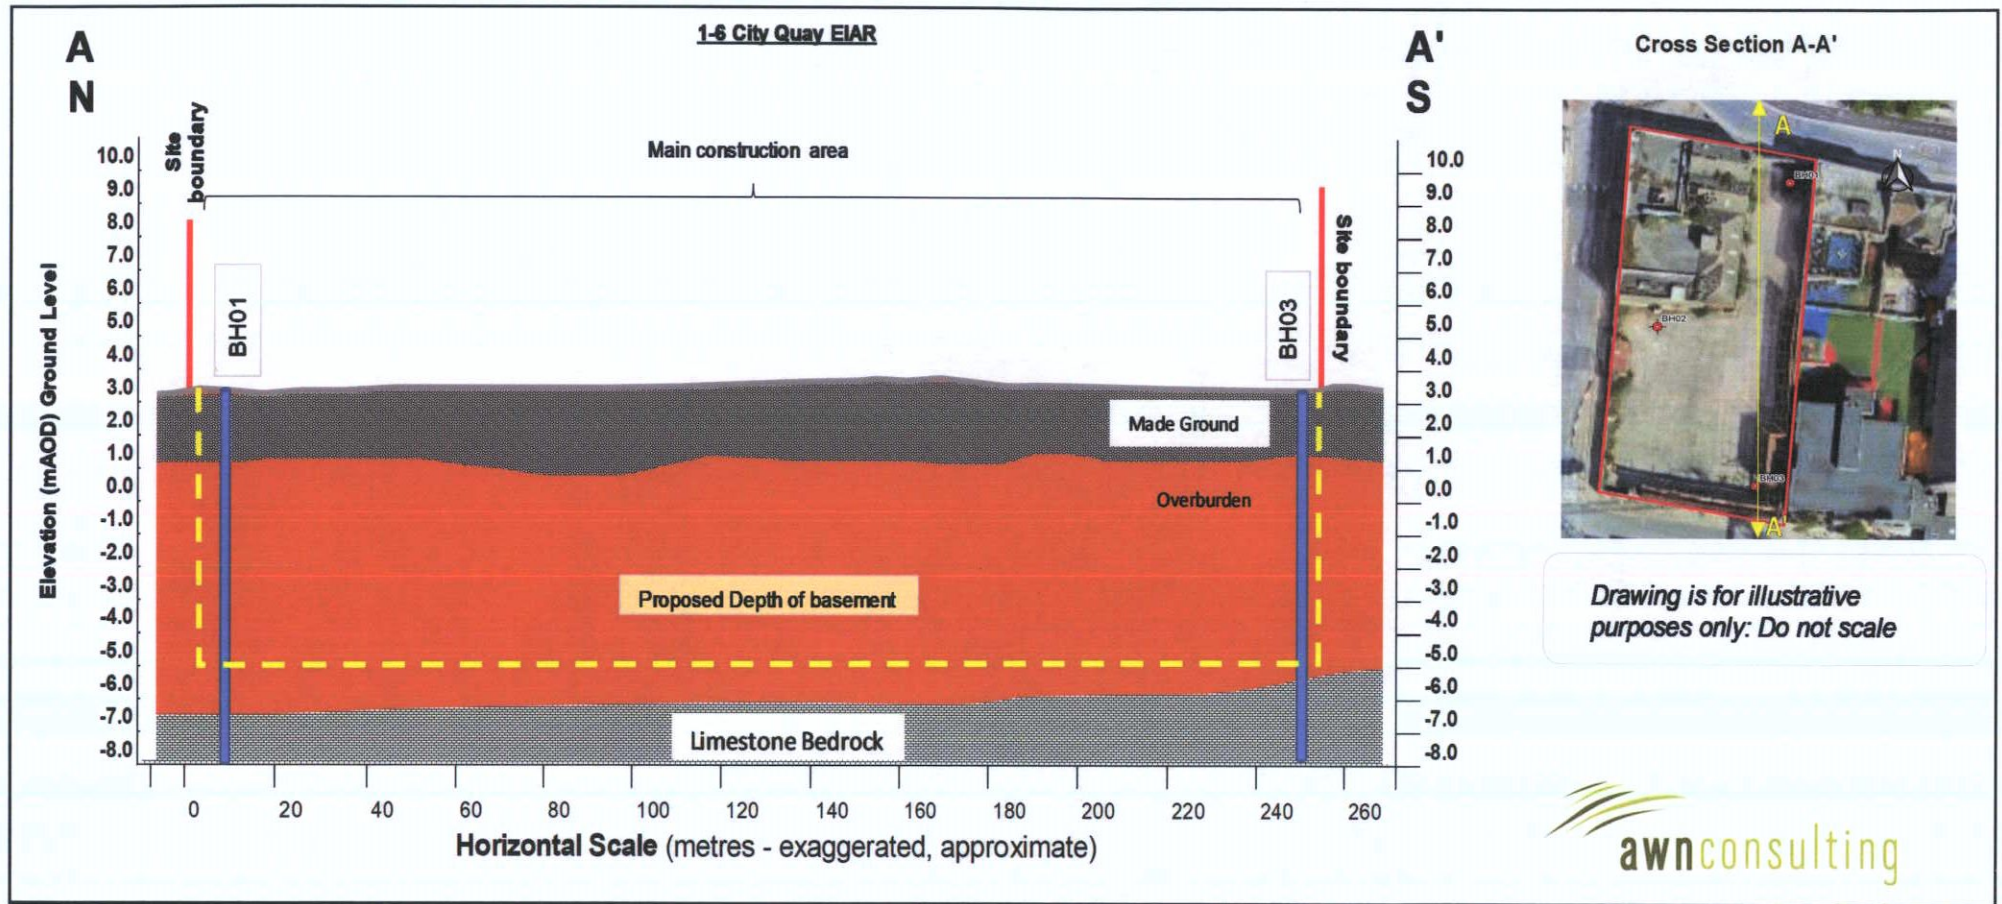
Schematic Cross Section (N-S) of the Proposed Development site.
